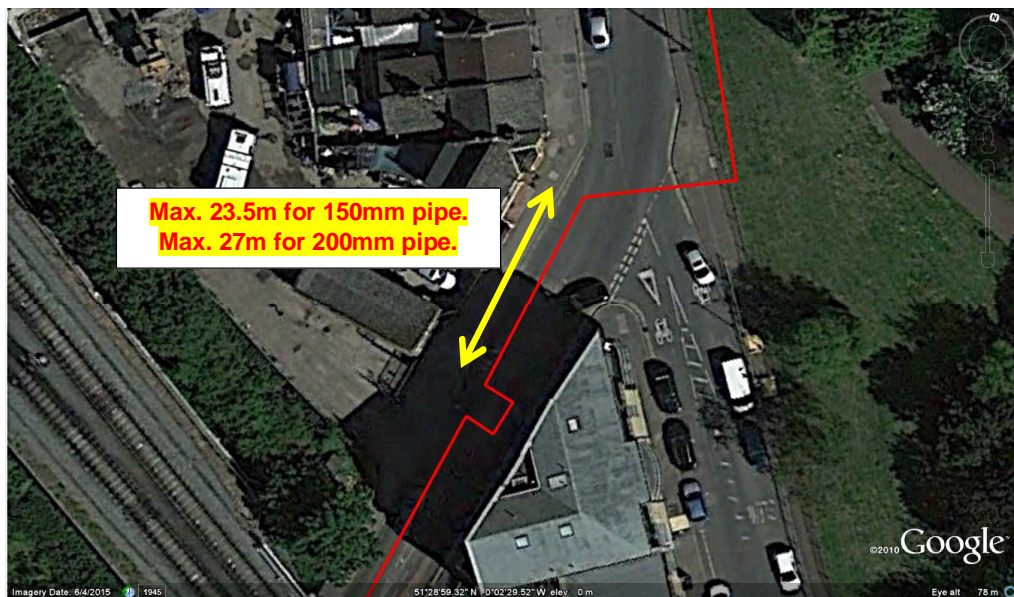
Pipe route at junction of Trundley's Road and Sanford Street
